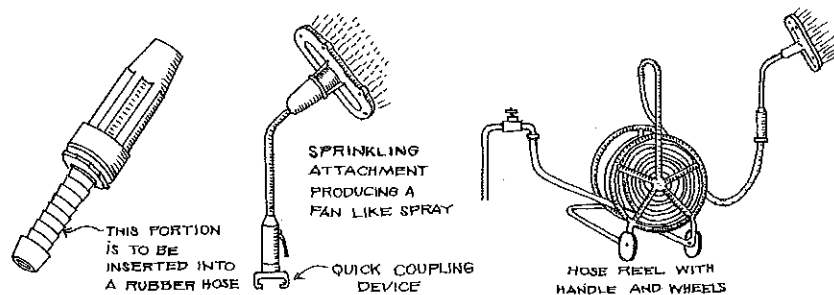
Adjustable nozzle, sprinkling attachment, hose reel with wheels
